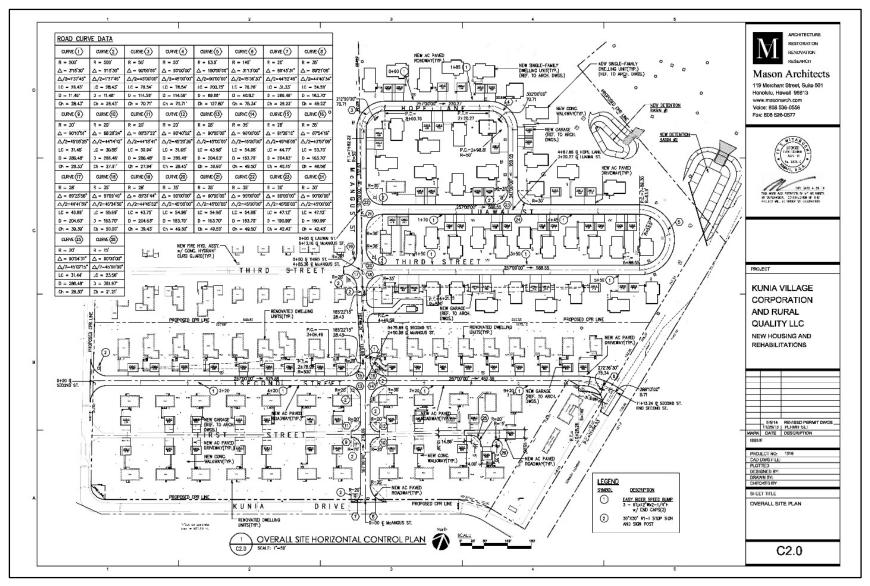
Development plans for the Kunia Village project area (Mason Architects 2014)
